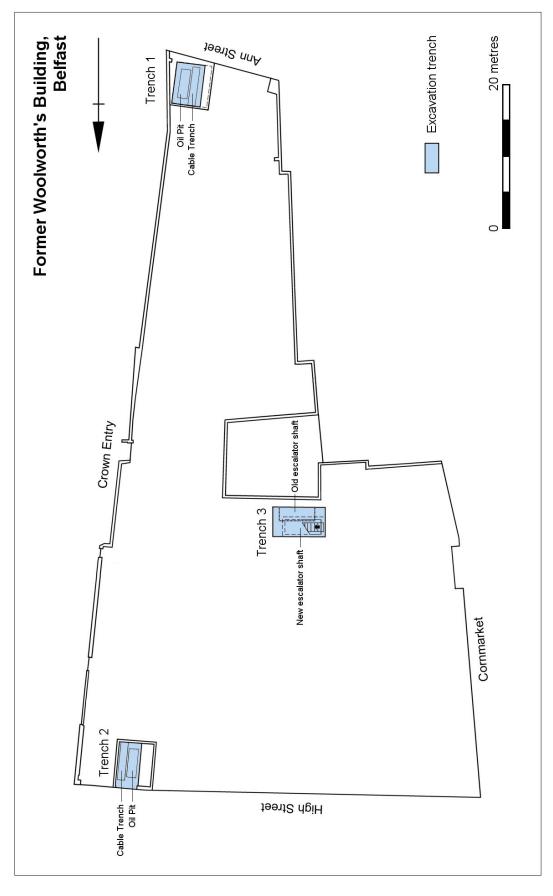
Plan of former Woolworth's building with 2003 excavation trenches
